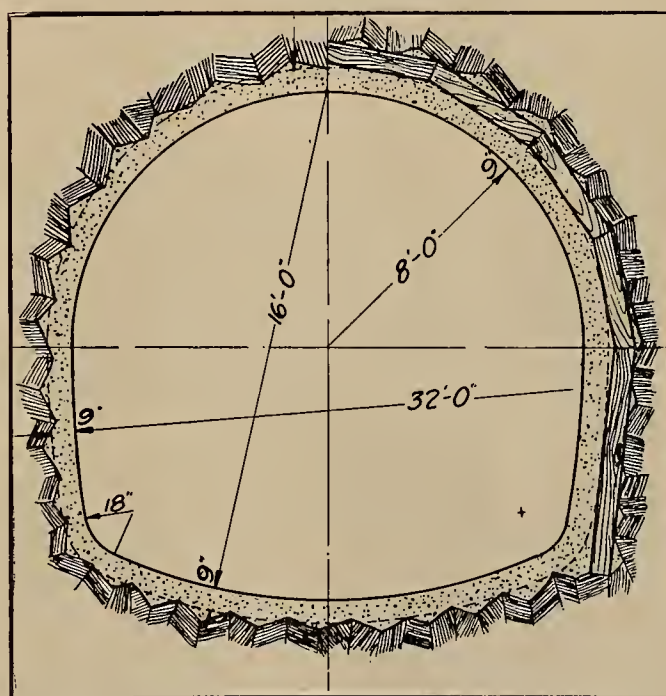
Typical tunnel section; also shows method of timbering where necessary to timber. Total net area, 216.4 sq. ft.
